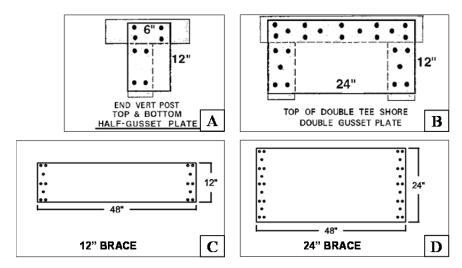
Nailing Patterns used for a Plywood Laced Post Shores
